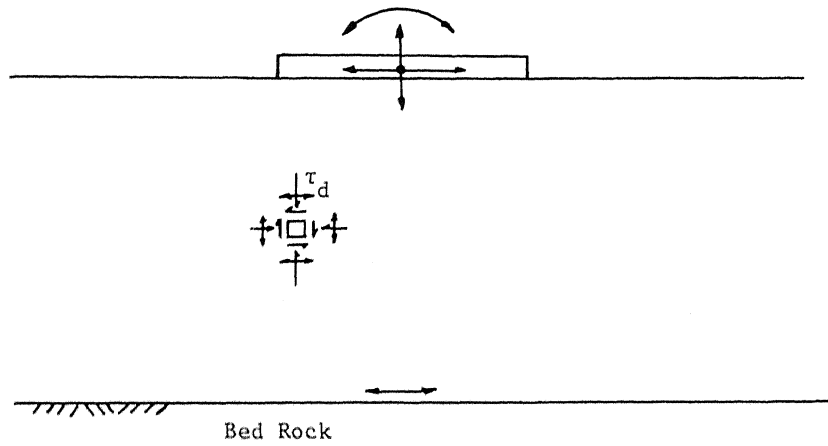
Earthquake Induced Stresses in a Soil Element under a Footing
